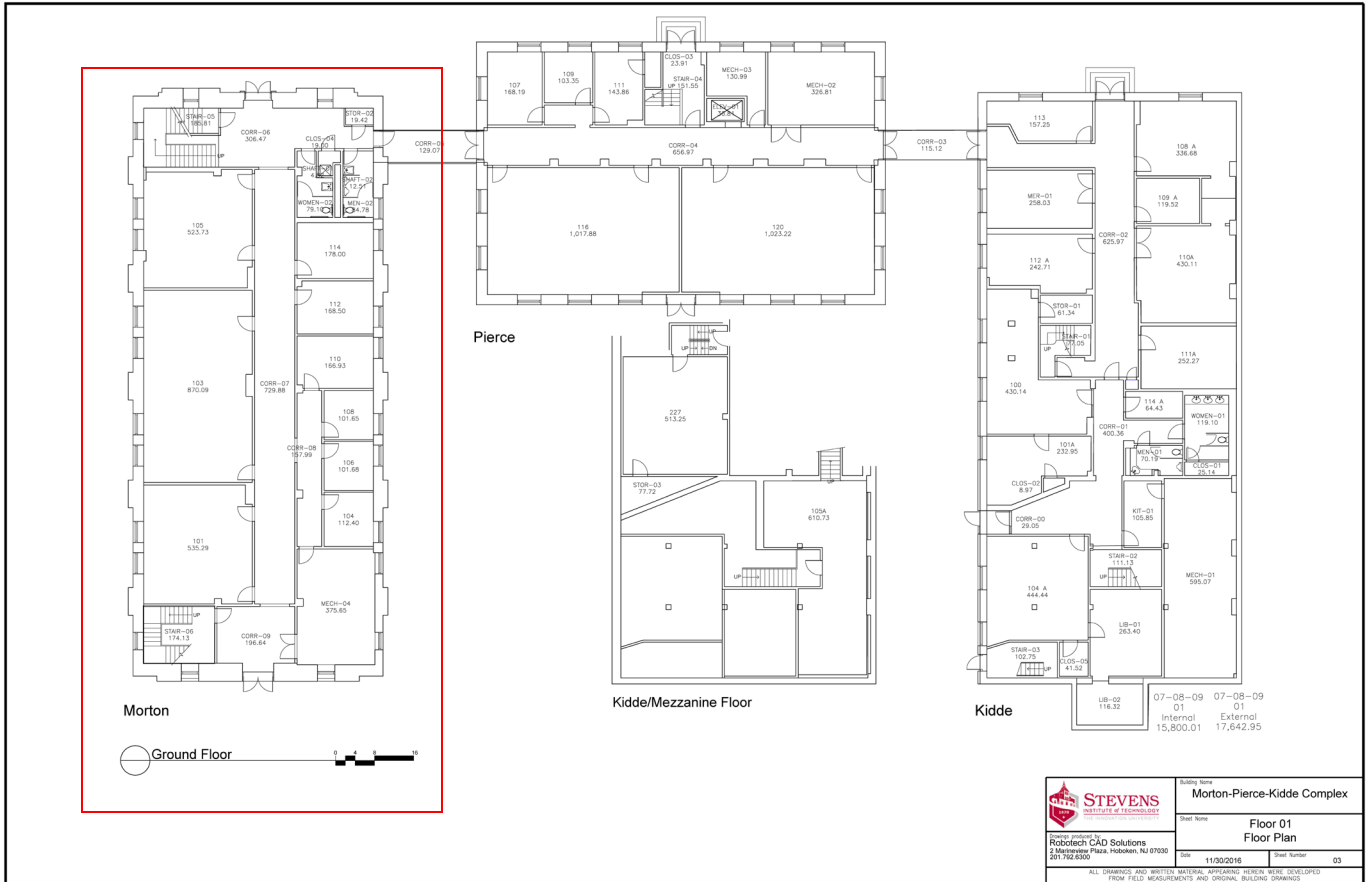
Morton Memorial Laboratory of Chemistry, First Floor Plan, outlined in red (2016).
